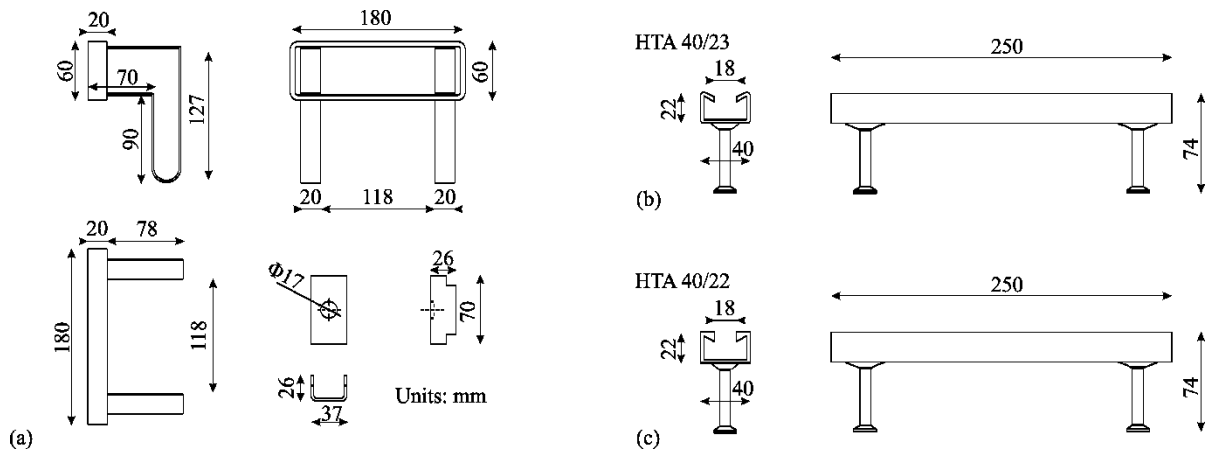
Geometrical details of the top bolted connection: (a) components of the connection, (b) cold-formed channels HTA 40/23 and (c) hot-rolled channels HTA 40/22
